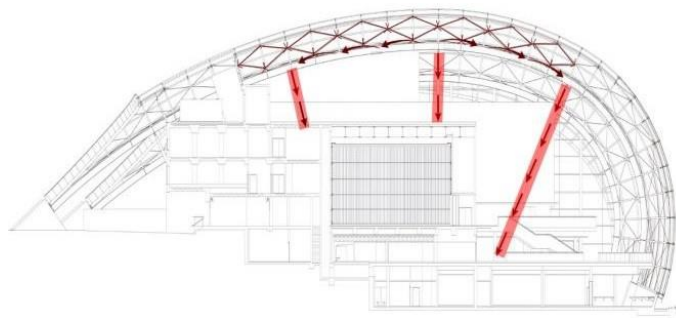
Additional Structural Elements in section view (Stephens, S, 2005)
